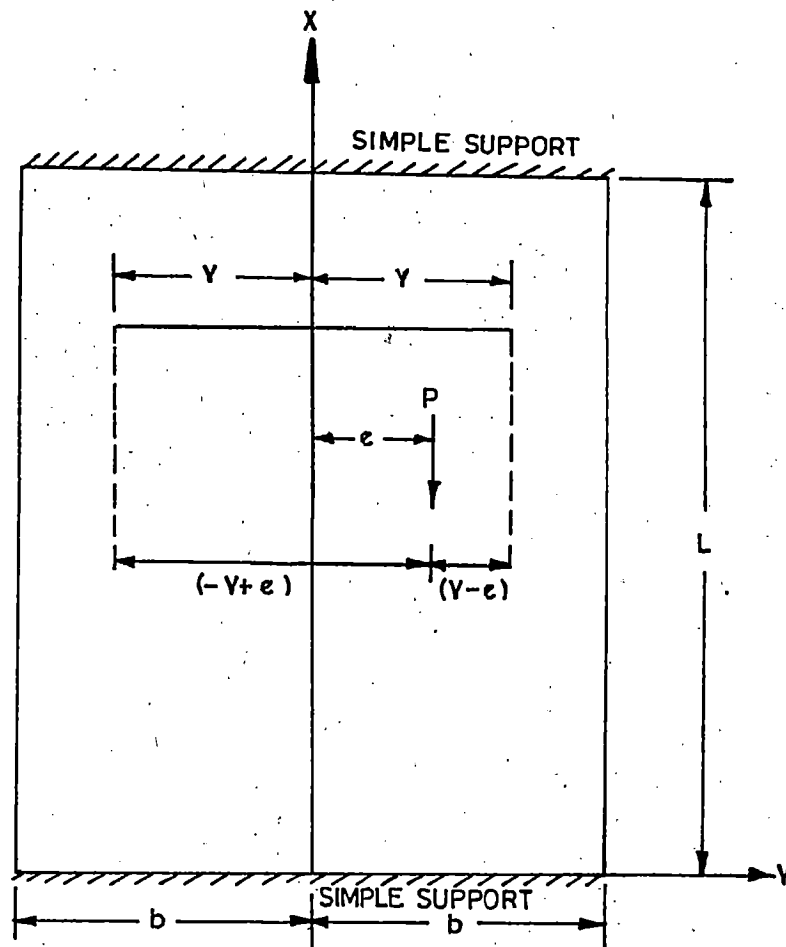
BRIDGE DECK OF FINITE WIDTH
